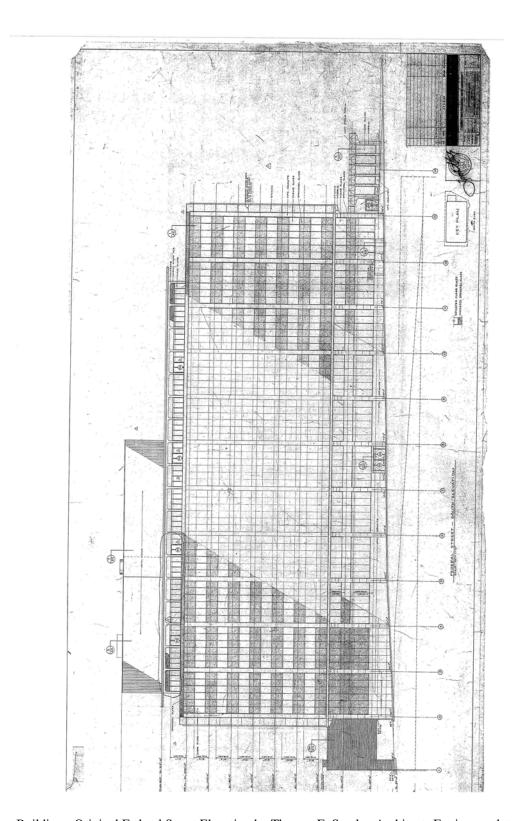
Mayflower Building - Original Federal Street Elevation by Thomas E. Stanley Architects Engineers, dated May 1964.
